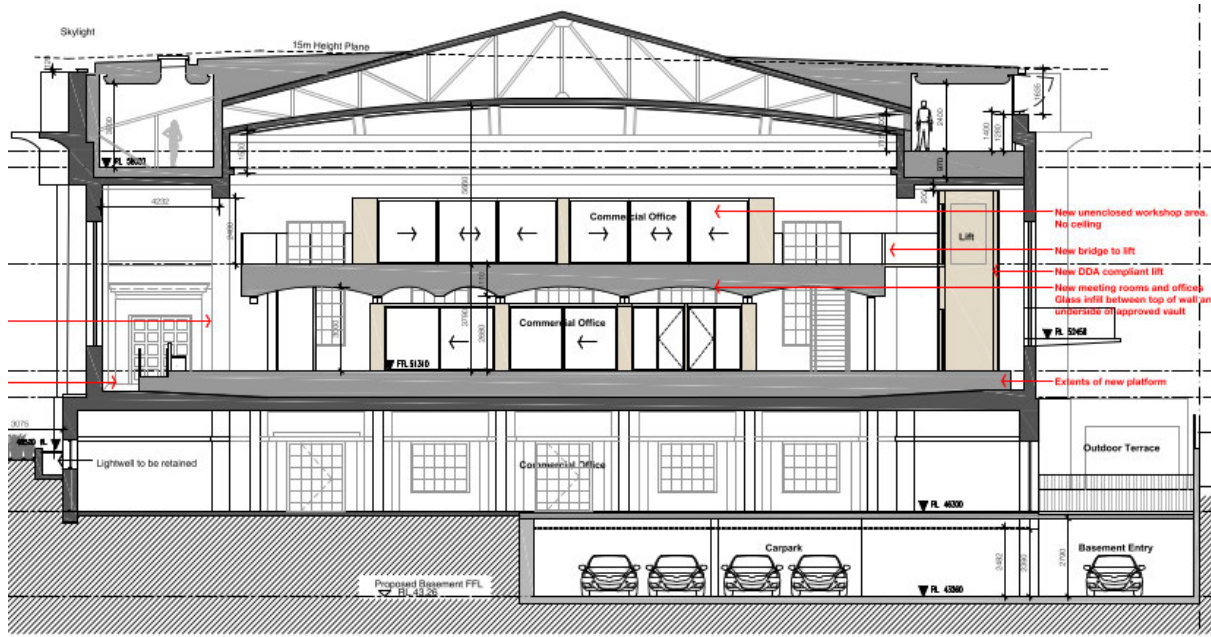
Section through auditorium illustrating platform with mezzanine and proposed lift
